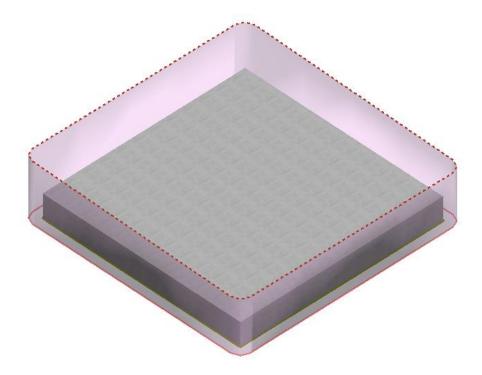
G – Example of Structure Excavation Surface Terrain Model for a Footing
